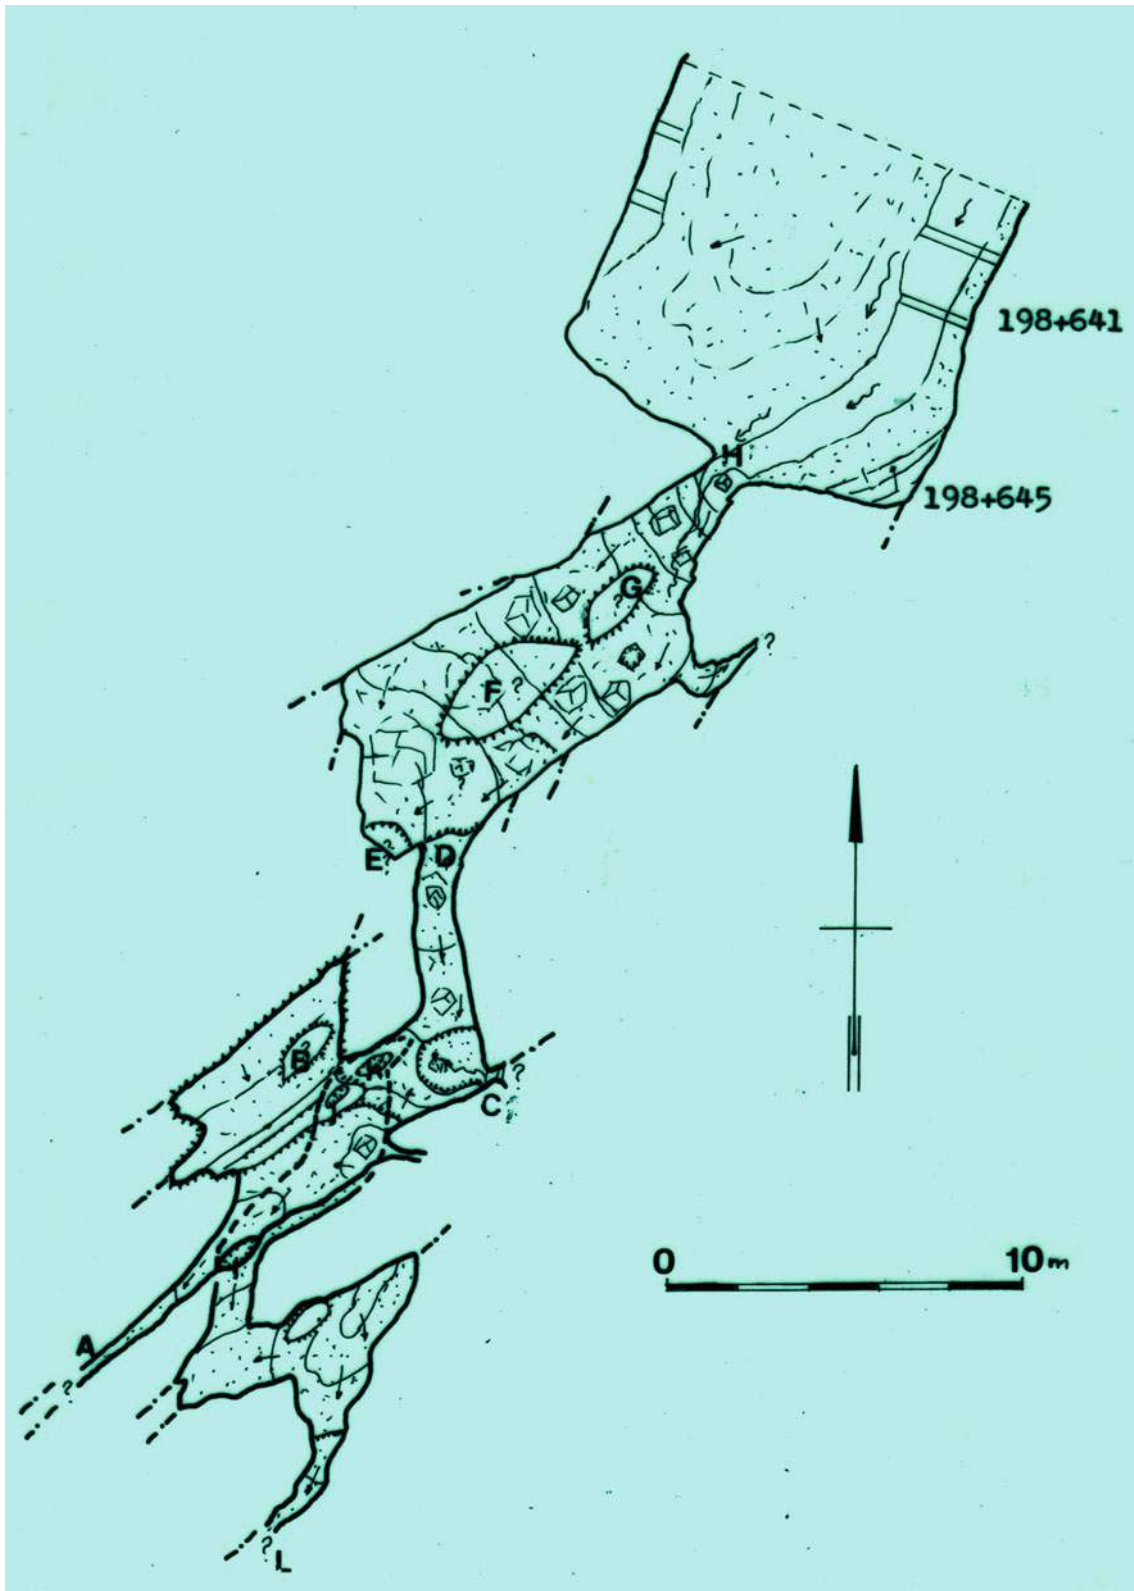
Plan of cavern at km 198 + 645 in Sveti Rok Tunnel
